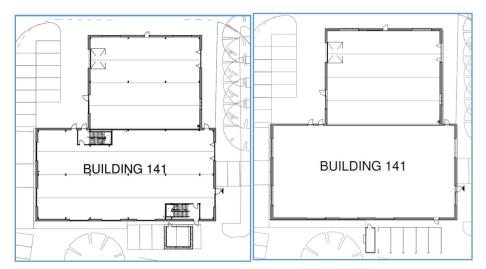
Approved (left) and proposed (right) site location of plant enclosure
